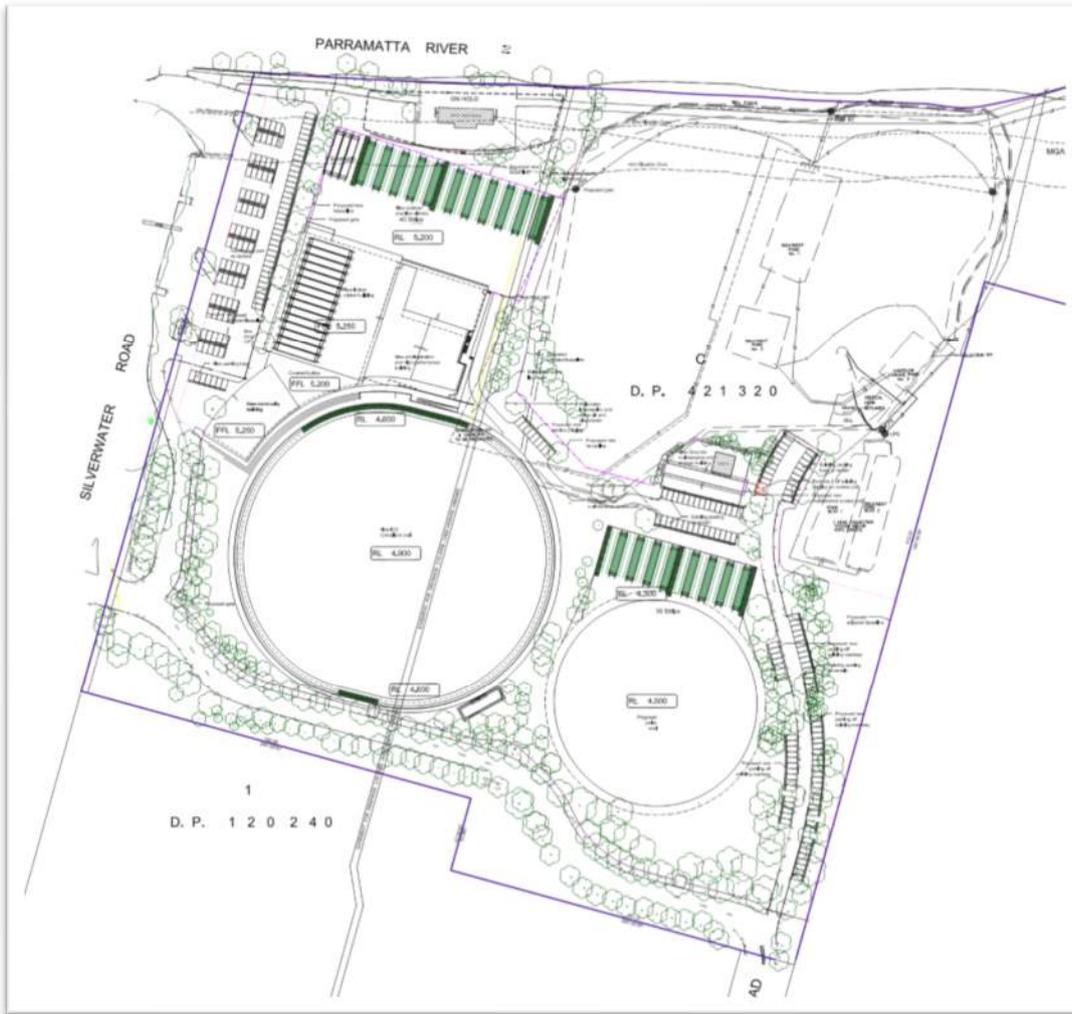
Proposed Site - Cricket NSW Site Layout (Cox Architecture)
